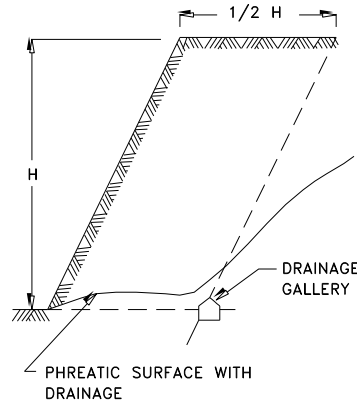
OPTIMUM DRAINAGE GALLERY LOCATION IN A SLOPE
